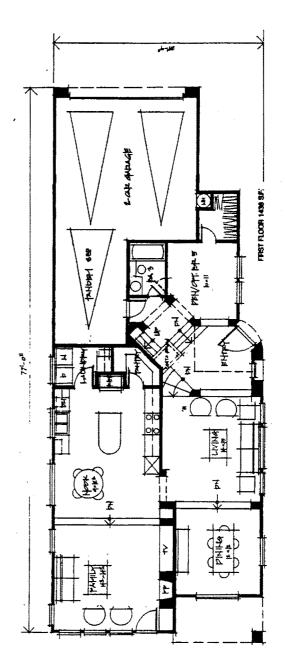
APPLICATION NO. 6-99-48 Floor Plan
